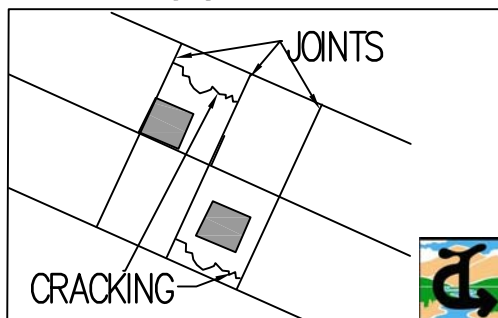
Example 3: Do not leave strips of pavement less than one-half lane in width.
